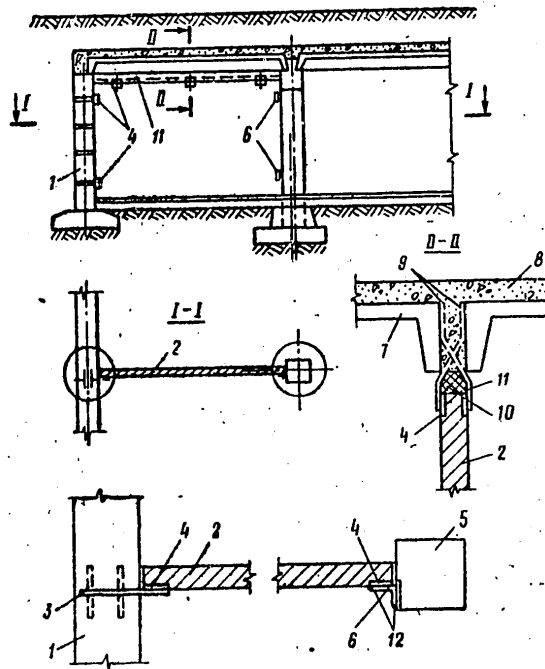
Structural decision for attachment of precast reinforced concrete inner wall
